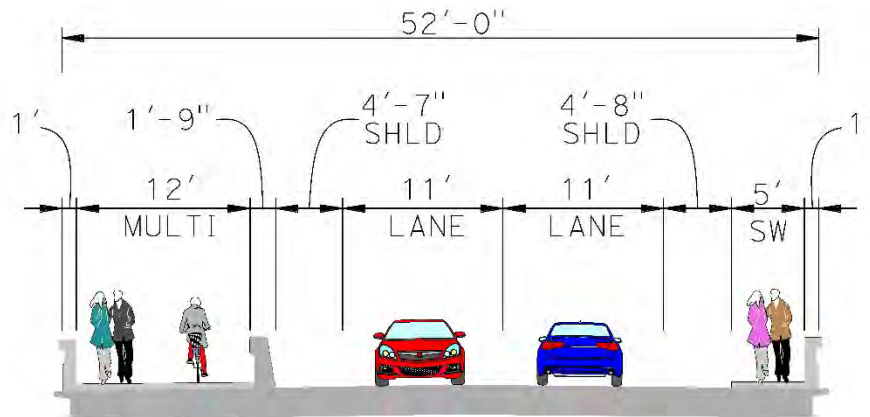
Vernon Street Bridge over Dry Creek – Proposed Configuration
